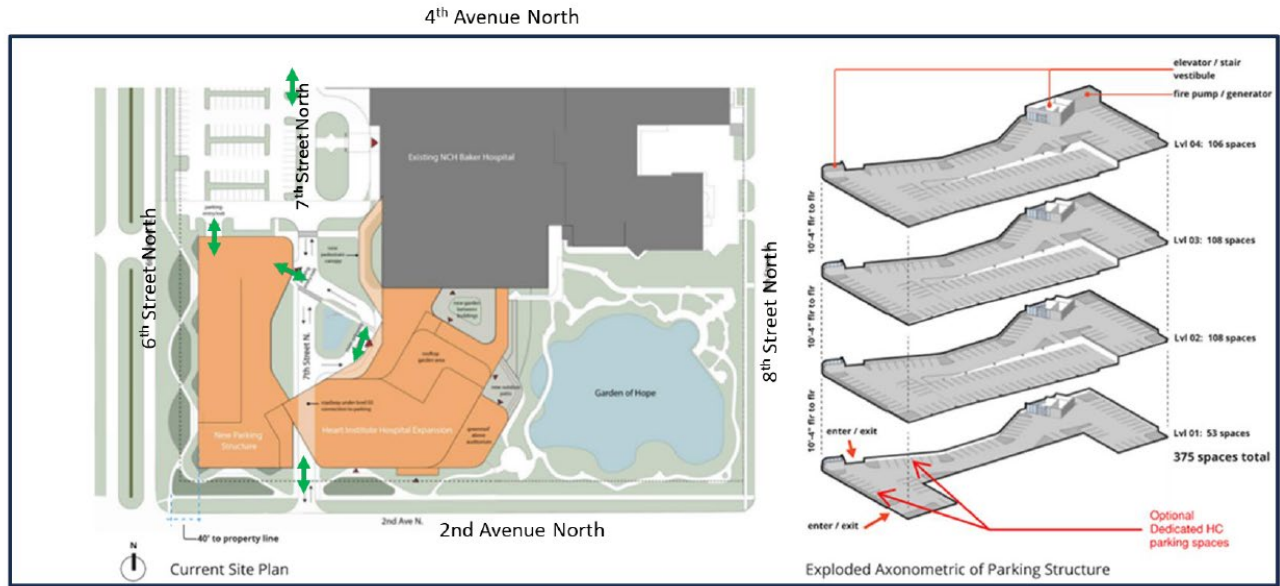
Site Plan Detail (orange) of Garage (left) and Proposed Hospital Expansion (right), as well as exploded garage levels (far right).
